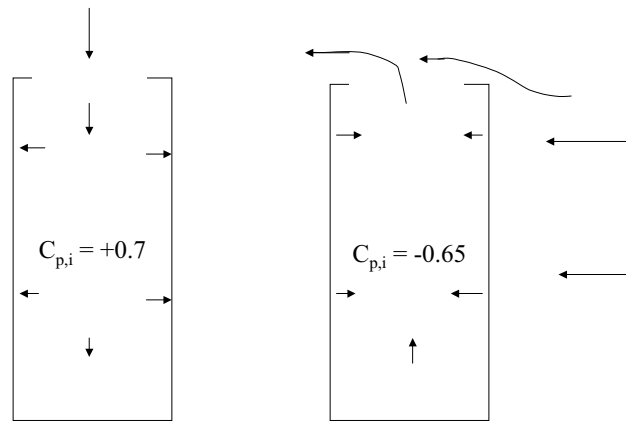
Internal Pressure Coefficients $C_{p,i}$ for a building with a dominant opening (shown in plan view)
